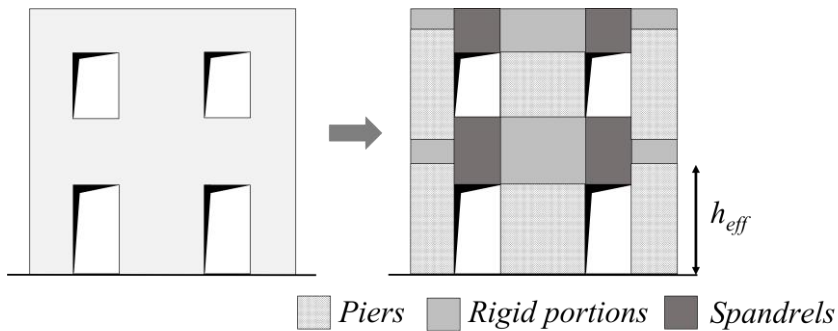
Modelling of a masonry wall through the Equivalent frame method
